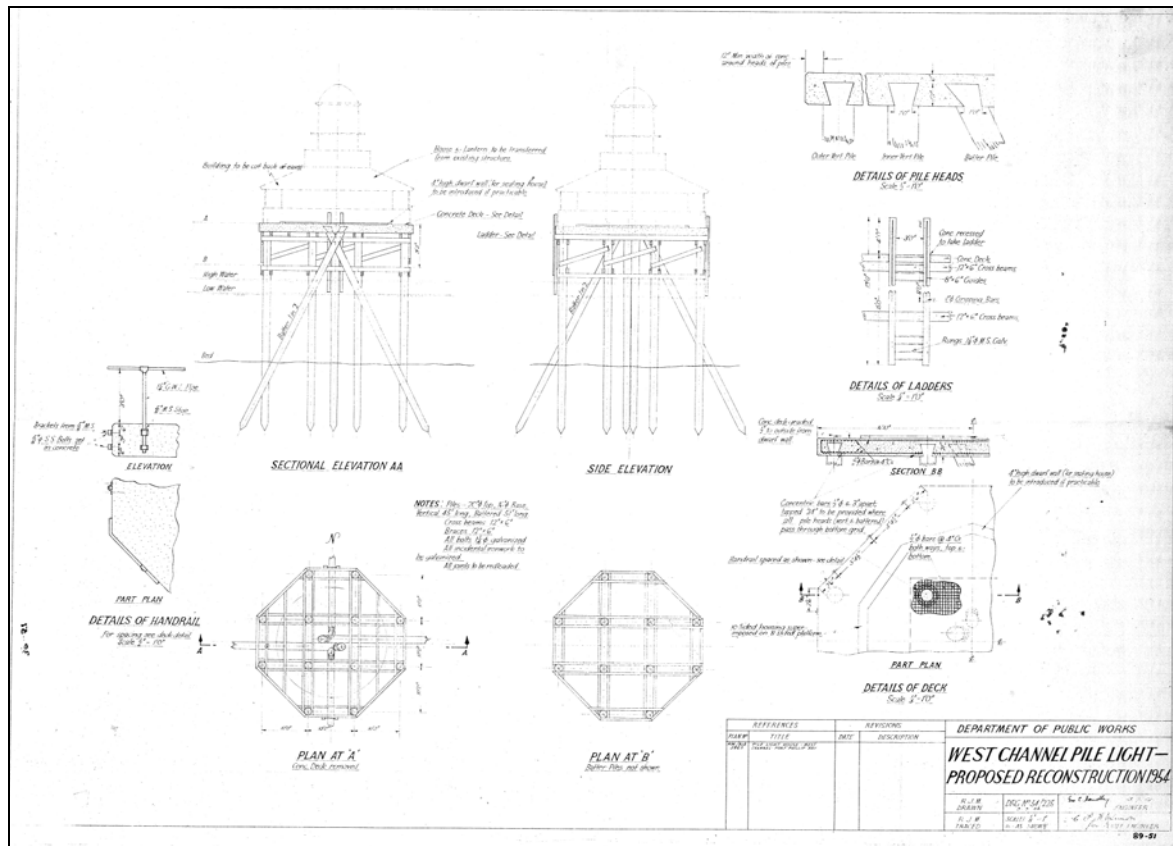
37: Plan of Reconstructed West Channel Pile Light (DPW 55/225:1954, QMM Collection).
